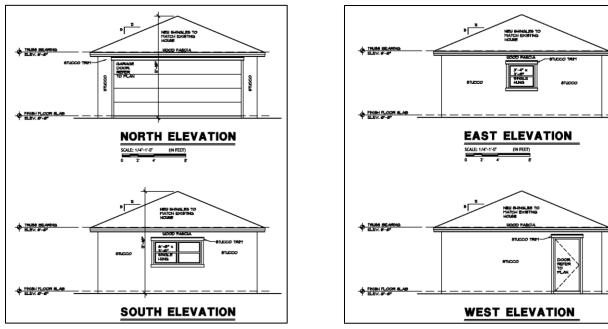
Proposed elevations. The north elevation will face the rear alleyway
